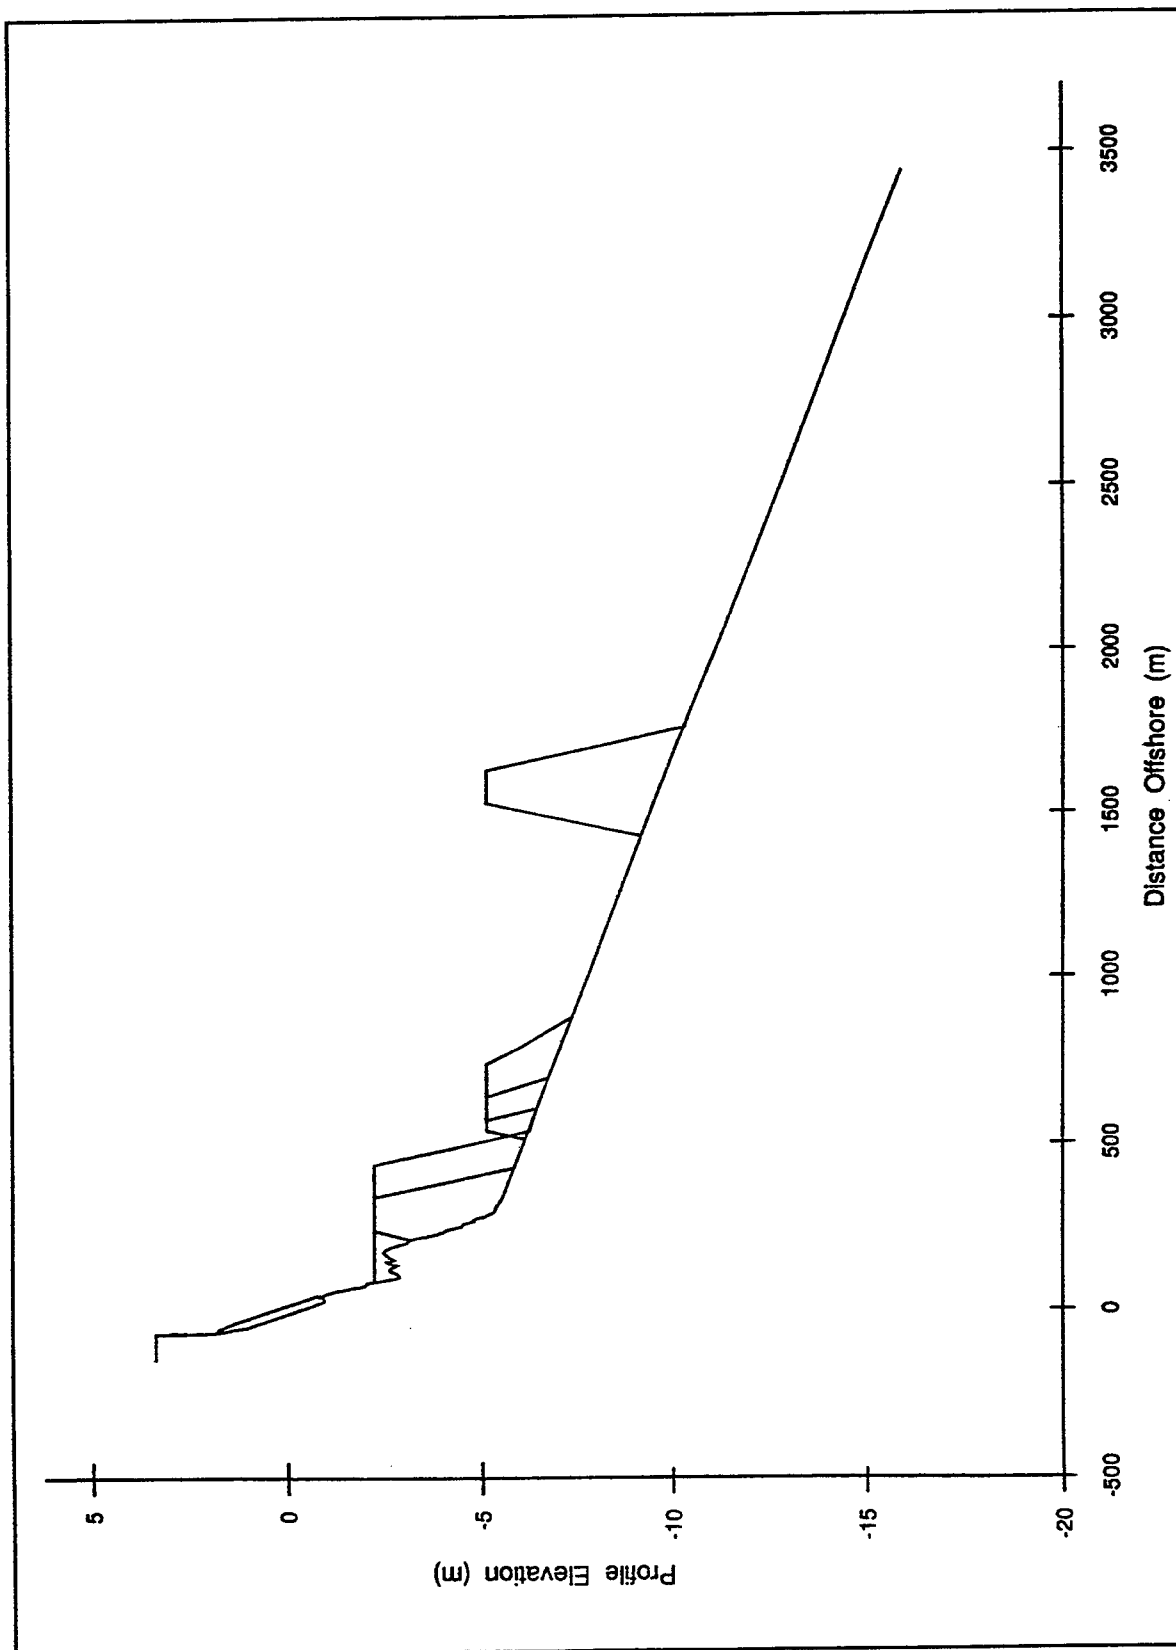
Nearshore-berm/beach-fill alternatives (Profiles 2-10) superimposed on Profile 1 (elevation in meters NGVD)
